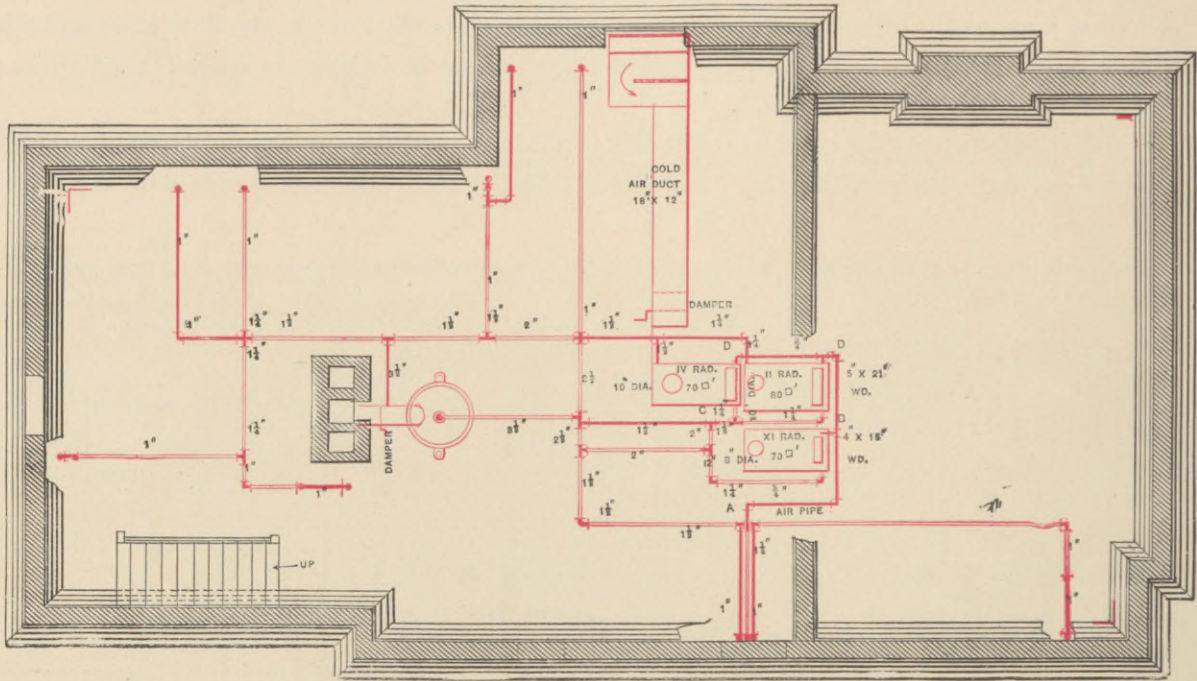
Plan of Cellar of Cottage Residence. Scale 1/8 inch to the foot.
